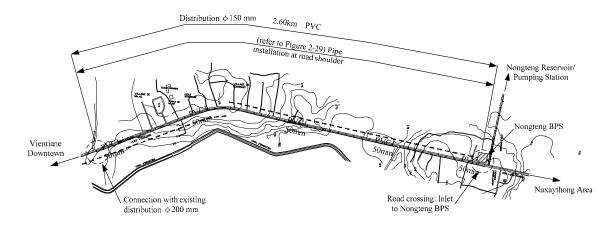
Pipe alignment located 6.06 to 6.77 km from the Kaolieo Treatment Plant
